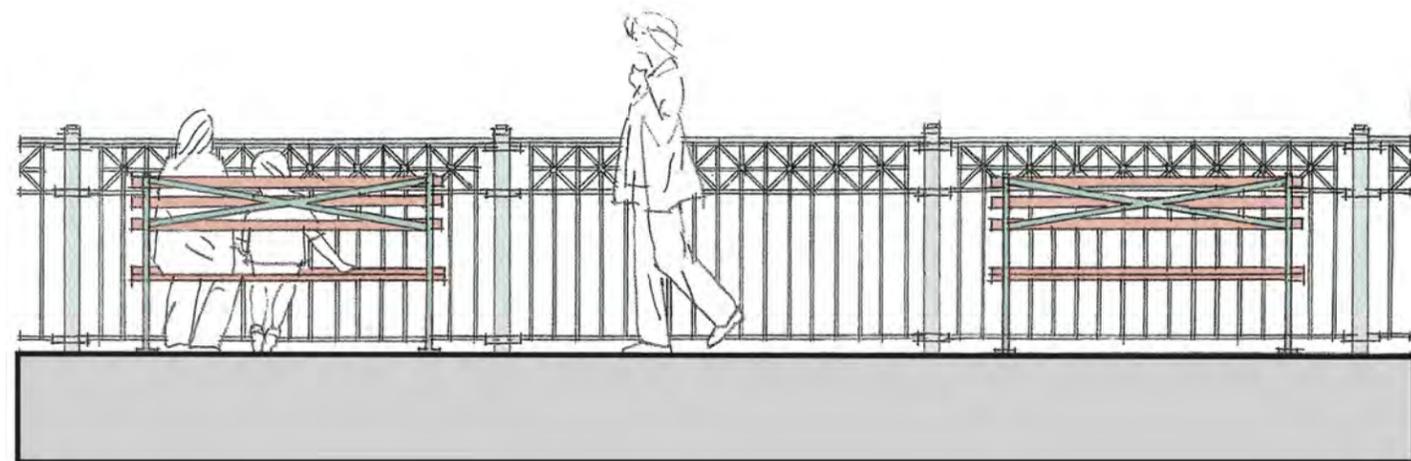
Guard Rail Option - Type B, Typical Elevation of Promenade Edge with Existing Vocabulary of Benches and Guard Rails
